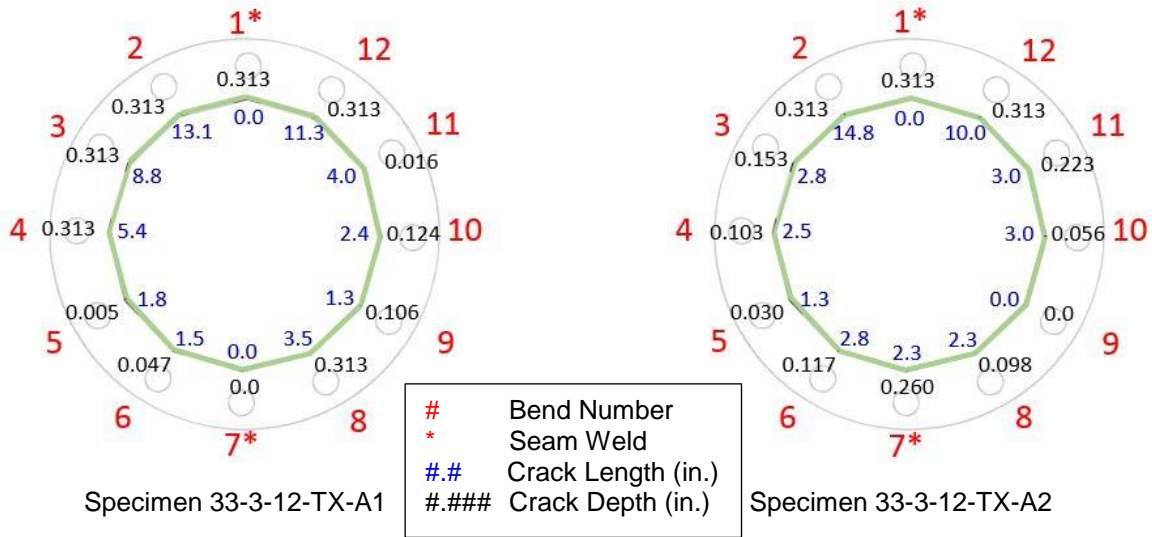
Specimens 33-3-12-TX-A1 and 33-3-12-TX-A2: Cracks after 19.4 Million Fatigue Cycles
